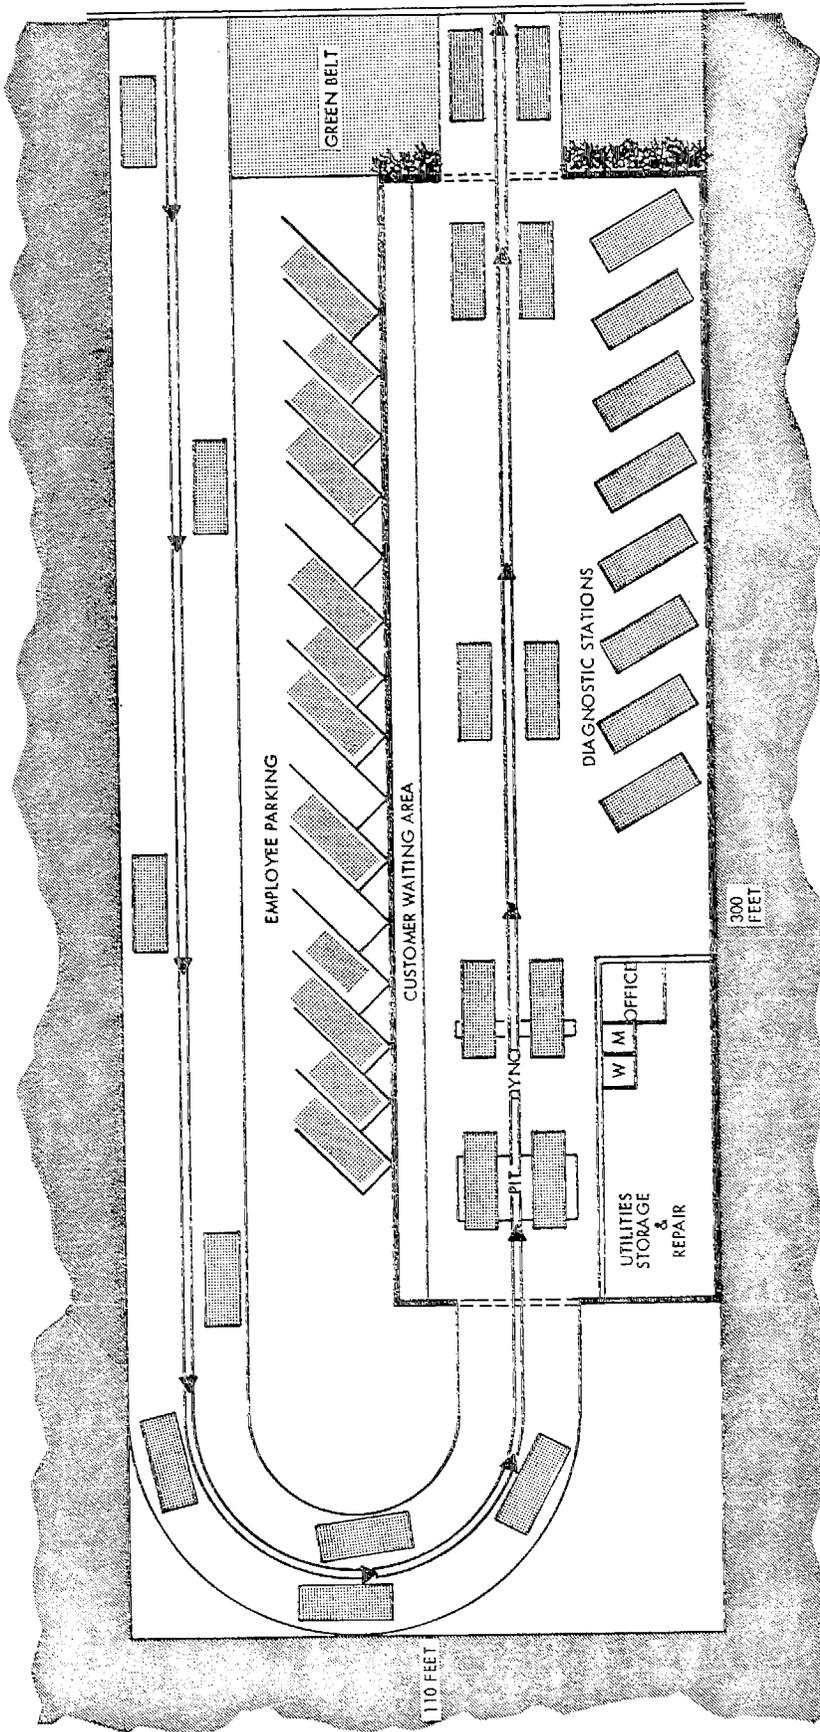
9. TWO-LANE STATION FLOOR PLANS (Sheet 1 of 3)
